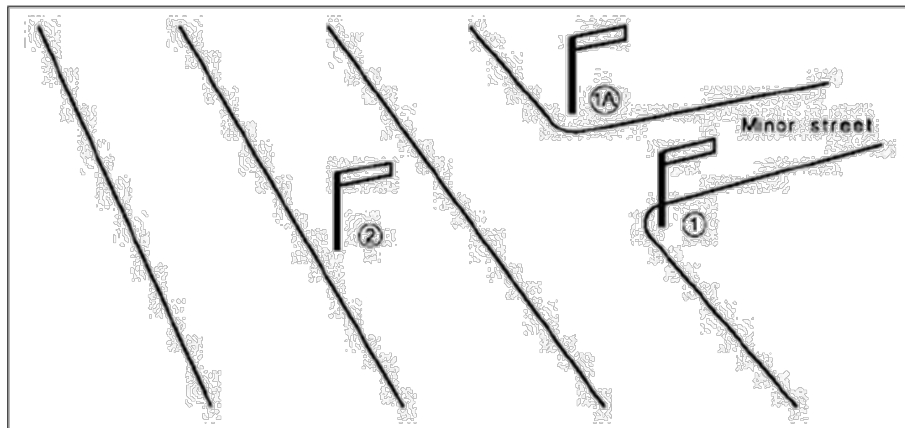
T-JUNCTION—MINOR STREET WITH DIVIDED MAJOR STREET—NO MEDIAN OPENING
